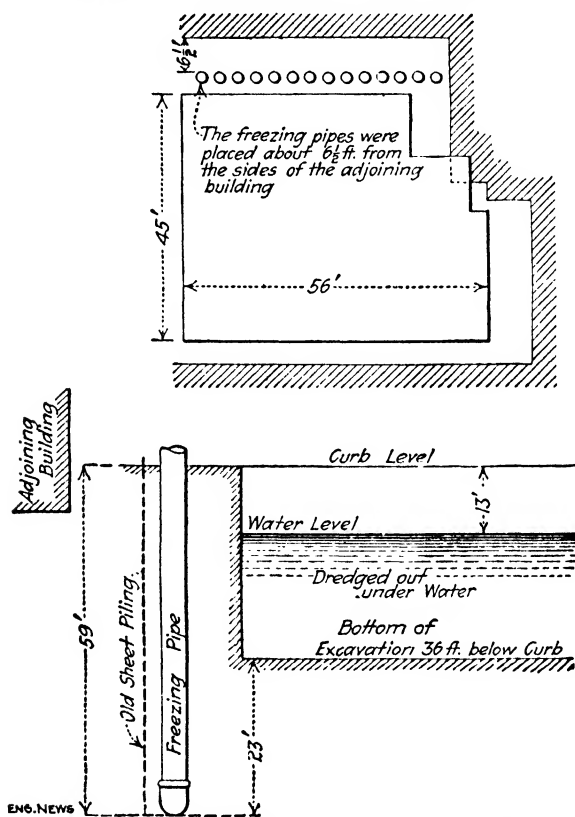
Building Foundation Constructed under the Freezing Process.
